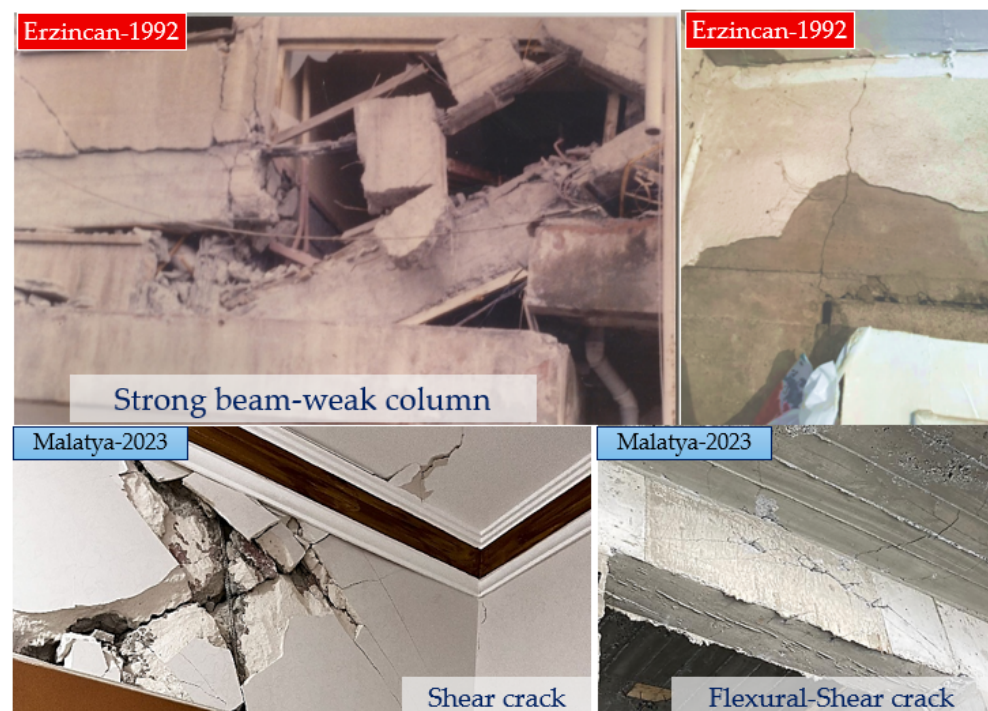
Examples of flexural–shear interaction, diagonal cracking, and beam-end damage observed in reinforced concrete beams following the 1992 Erzincan and 2023 Malatya earthquakes.
